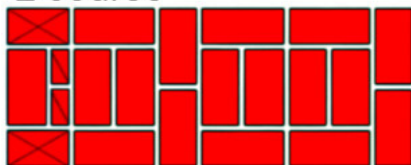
The order of laying bricks in the vertical constraint of the brick wall. Wall thickness 2 brick.
